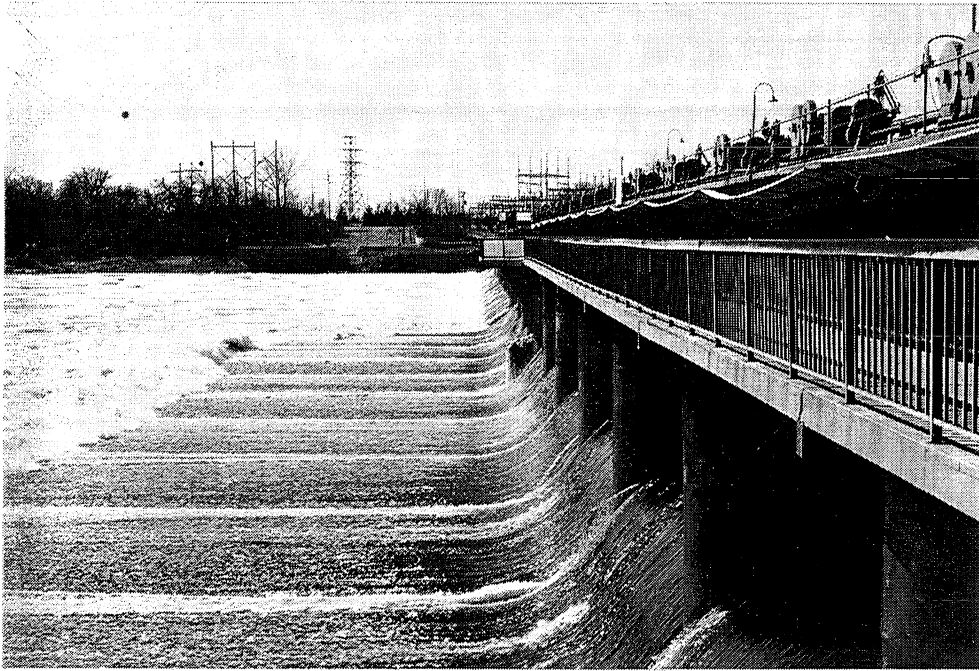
Downstream Coon Rapids Dam 3-27-90.
